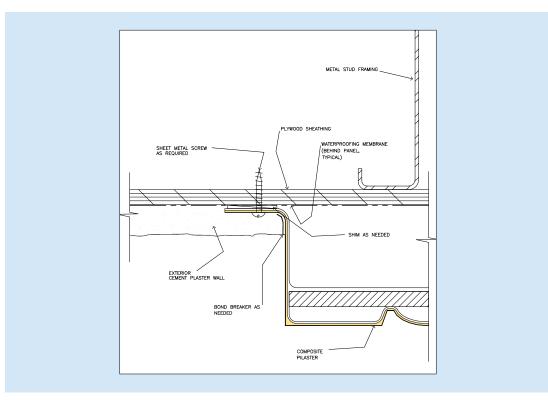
Section view: Internal support FRP panels attached to wood substrate
